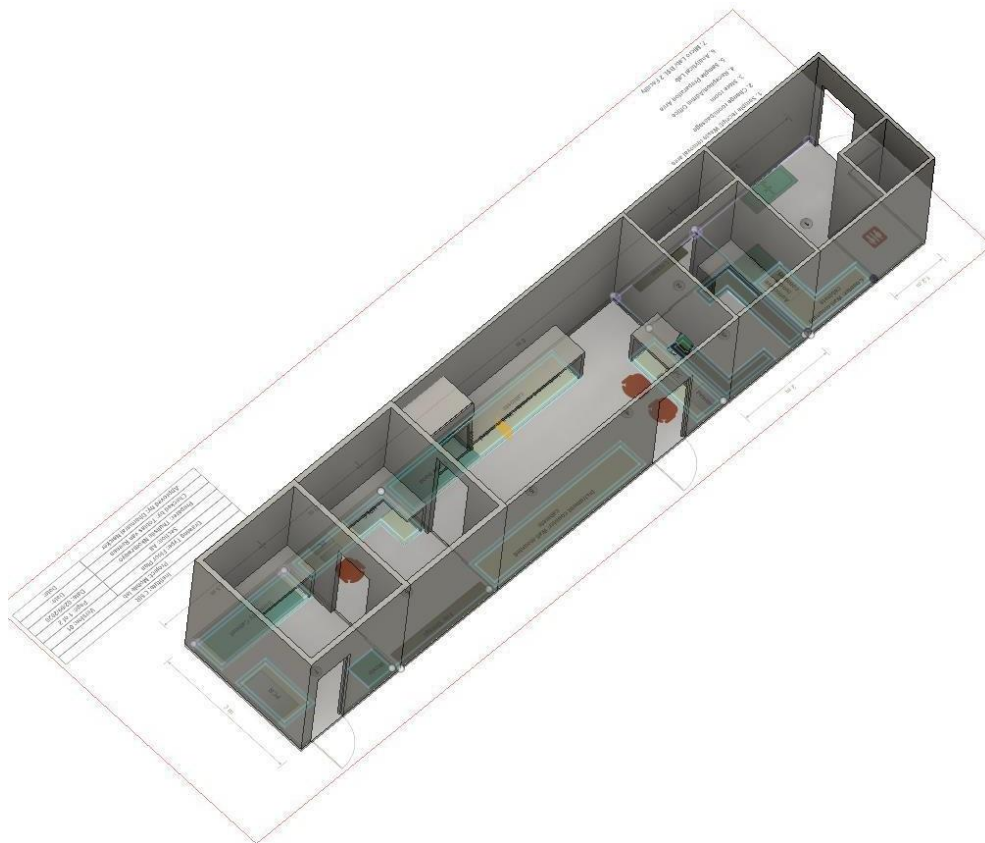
The layout of the Model 2 mobile laboratory floor plan showing elevations, as produced by CSIR Smart Places.
